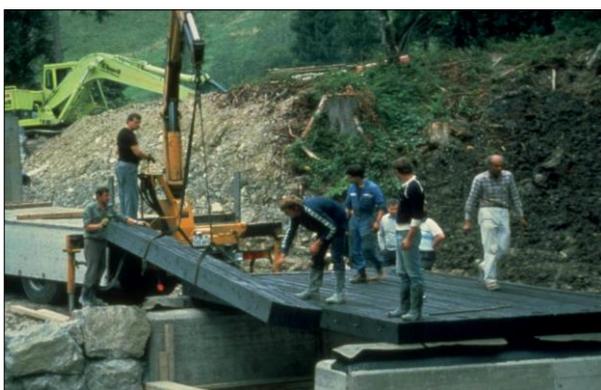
Forestry-Bridge-Typ with Stress Laminated Timber Deck Plates, Design: Prof. E. Gehri, Pictures: Archiv K. Schwaner.
